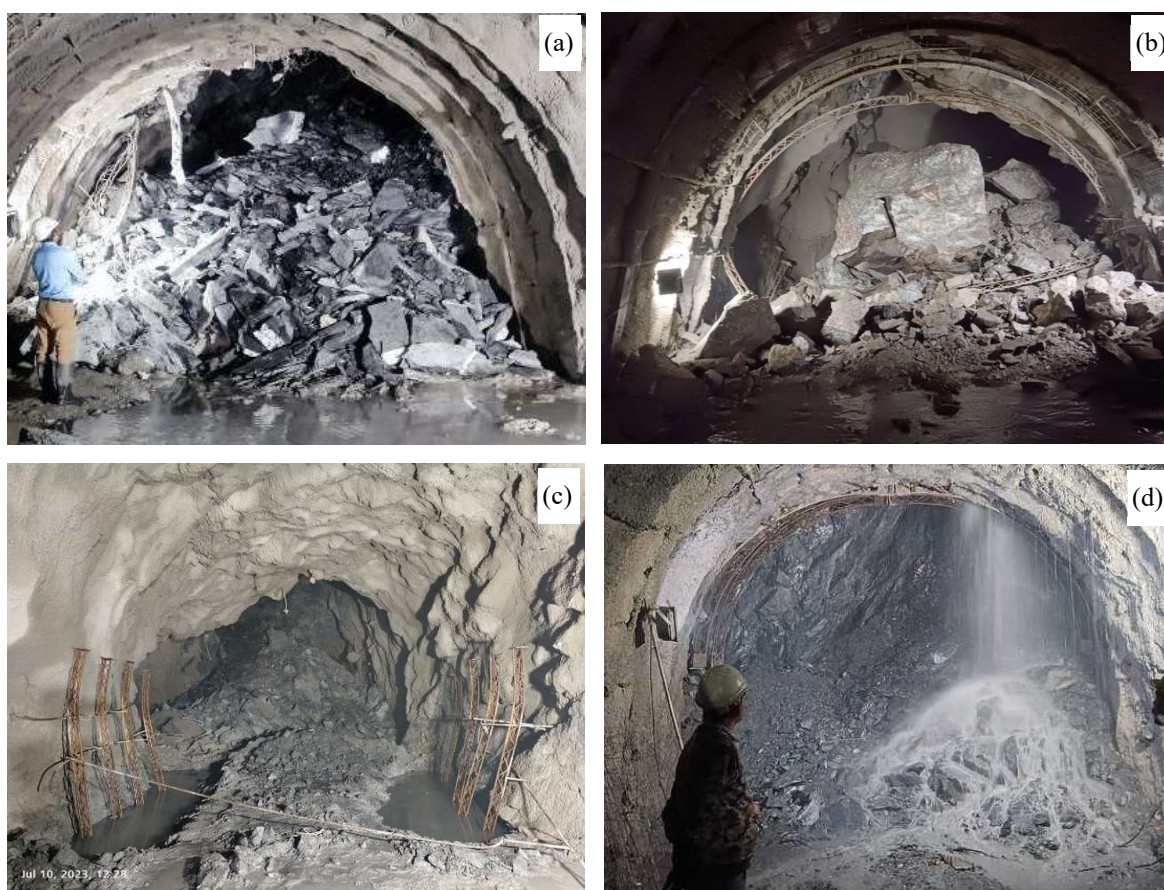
(a) Squeezing conditions in HRT face-2 in sandstone/shale rockmass with twisting & distortion of Lattice girders (LGs), spalling of shotcrete layers, rumbling/popping sound and consequent cavity formation; (b) Sudden spalling of 6.5cum of wedge block of gritty sandstone in HRT face-2, which was blasted out & demucked for revival of works at face; (c) Large cavity $>1D$ height in HRT face-3 with kinematically aggravated longitudinal extent of 21m vis-à-vis long persistence of bedding joint; (d) Puncture of perched aquifers in sandstone with sudden gushing of ~ 1000 LPM seepage and later on with max. 7000LPM seepage in SFT led to inundation of tunnel & halting of works.
